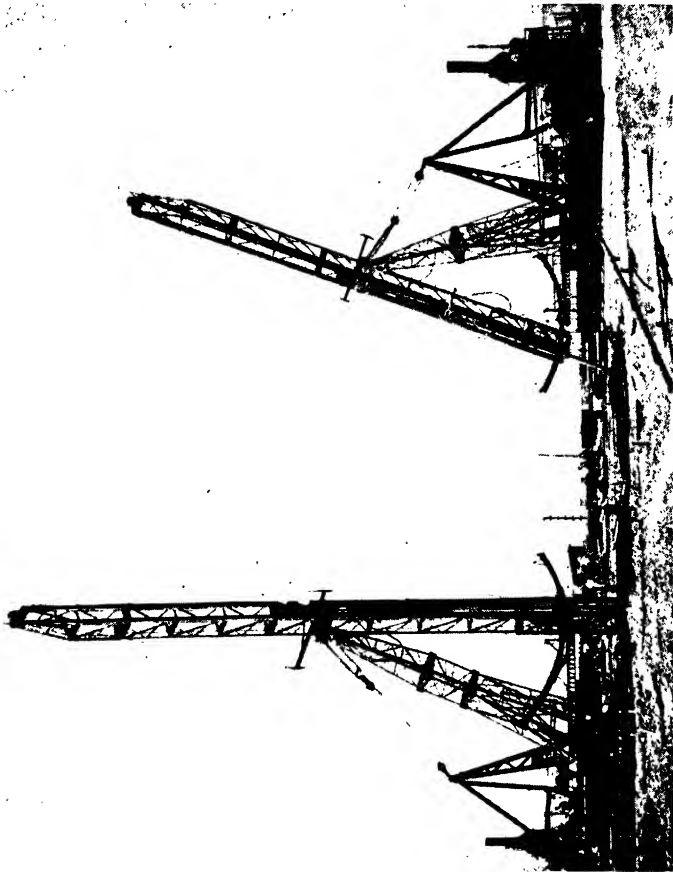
Steel Pile Drivers Used in Driving Casings of Raymond Concrete Piles.
